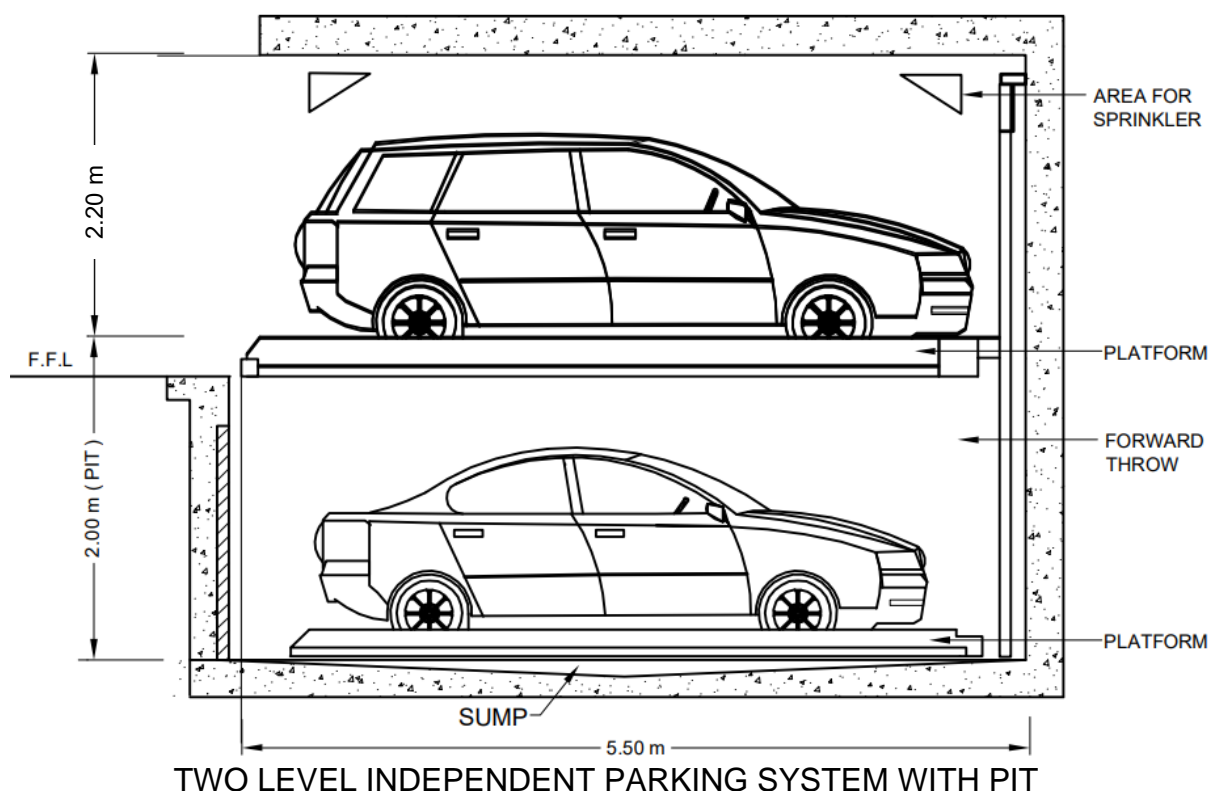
CROSS SECTION SHOWING FREE SPACE FOR SERVICES LIKE FIRE SPRINKLERS
